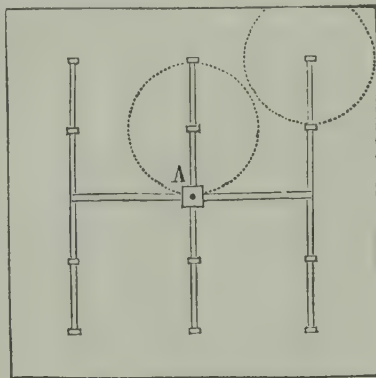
Plan of irrigation by underground pipes and stationary hydrants.
